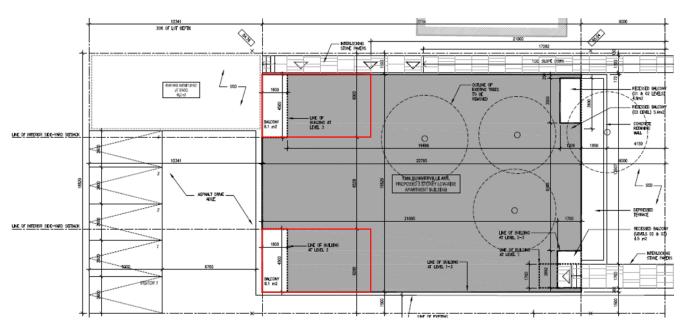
Excerpt from the Site Plan; the portions of the proposed building that are outlined in red do not comply with the existing interior side yard setback provision
